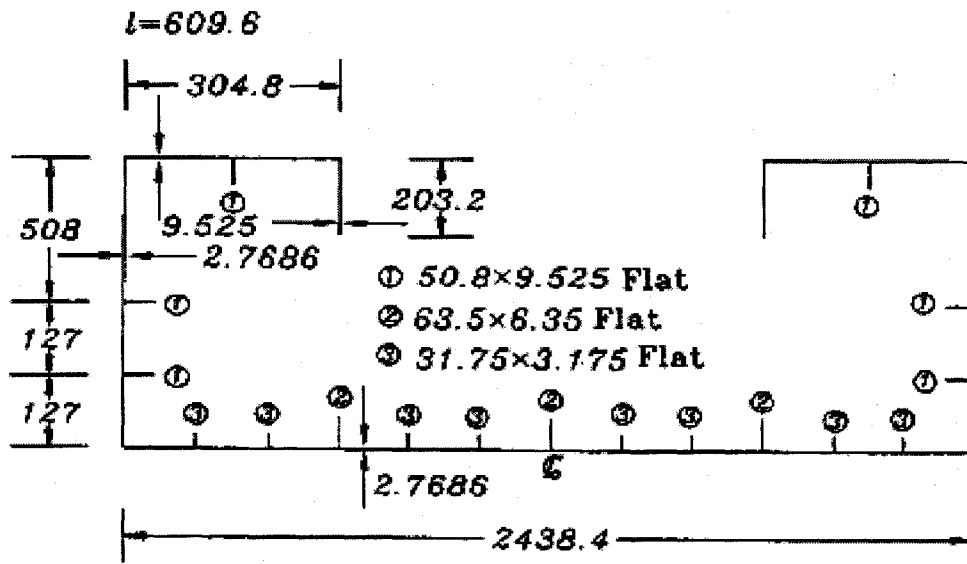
Midship section of Mansour's box girder model II tested in the hogging condition (unit: mm)
